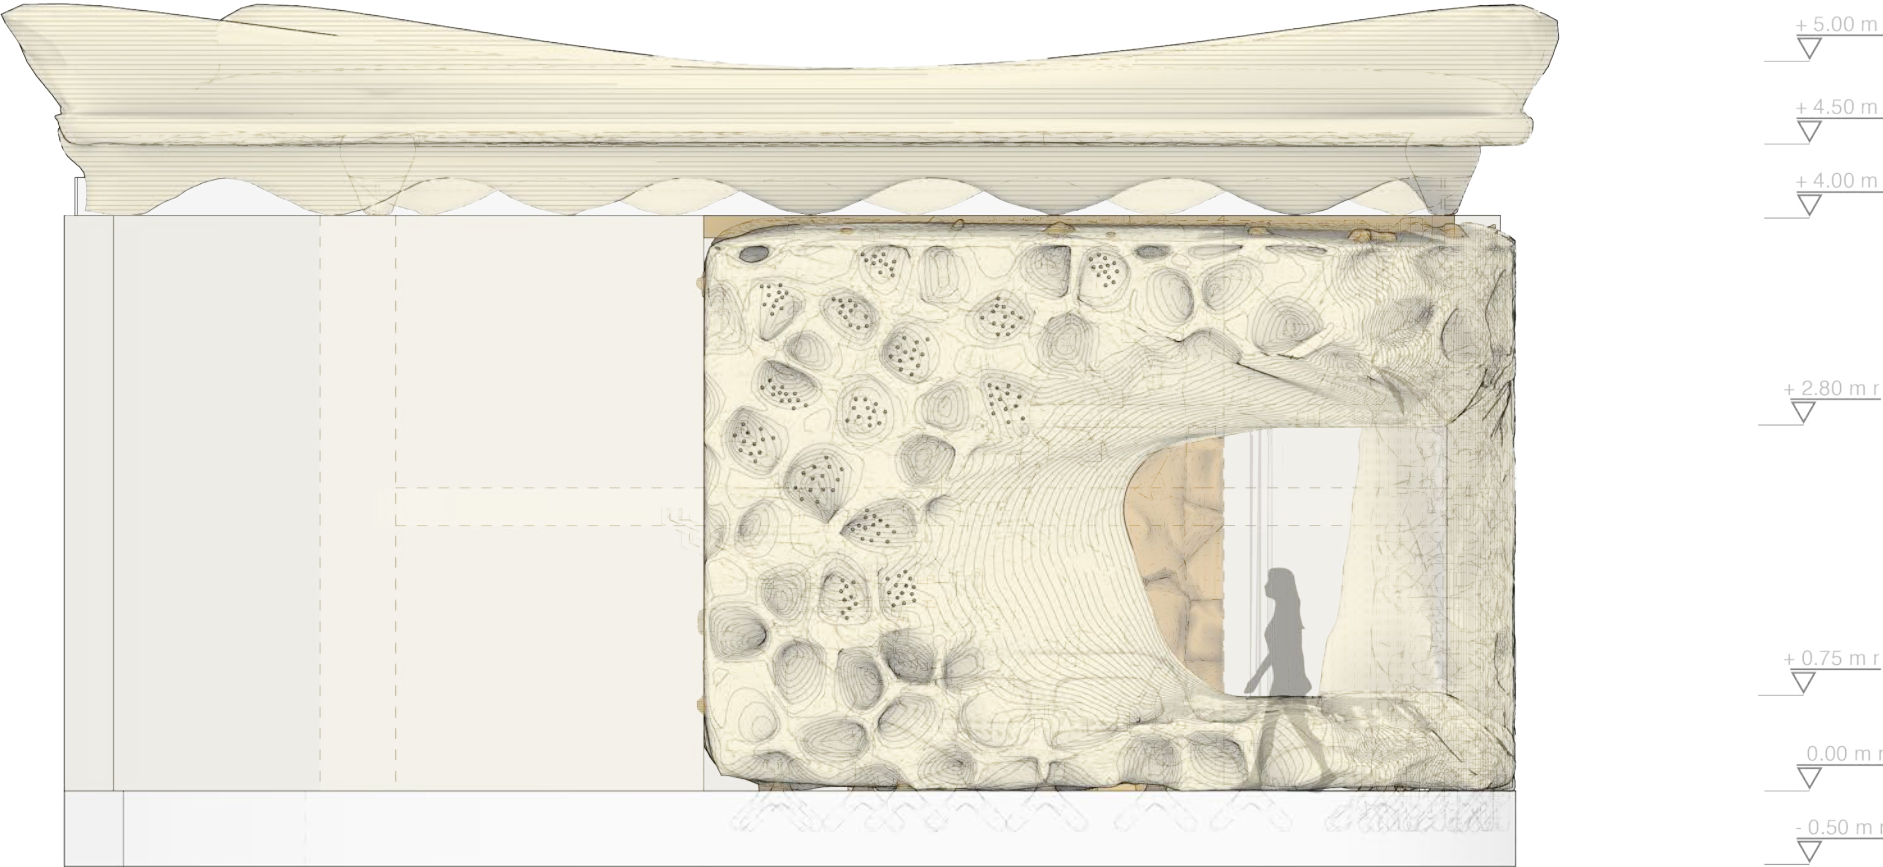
Exterior east elevation (2) - Scale 1 : 50
